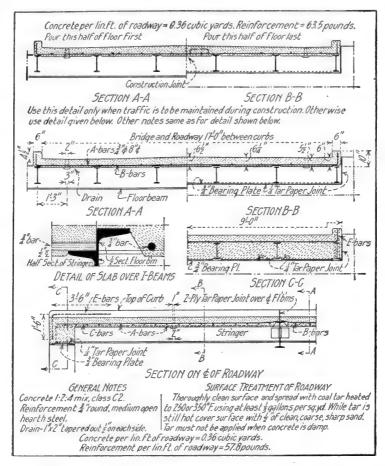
Reinforced Concrete Floor, Michigan Highway Commission.
